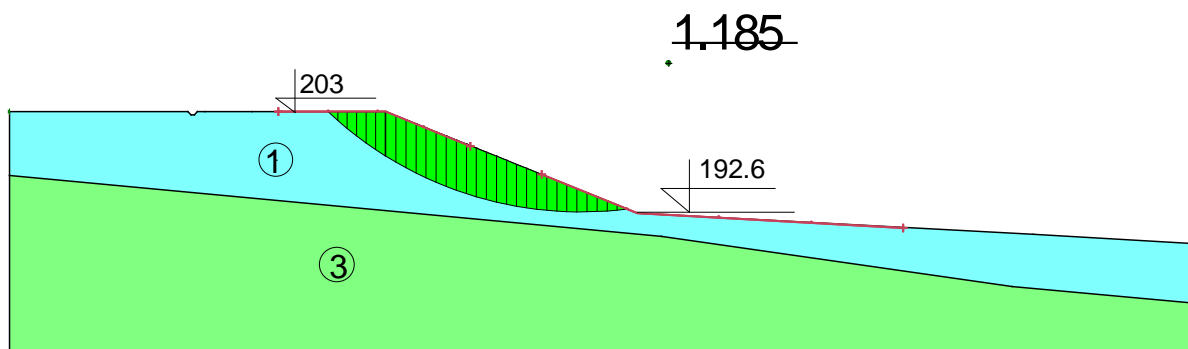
New landfill excavation – Section 22, Pseudostatic conditions (EC-08), $F_s=1.185$
